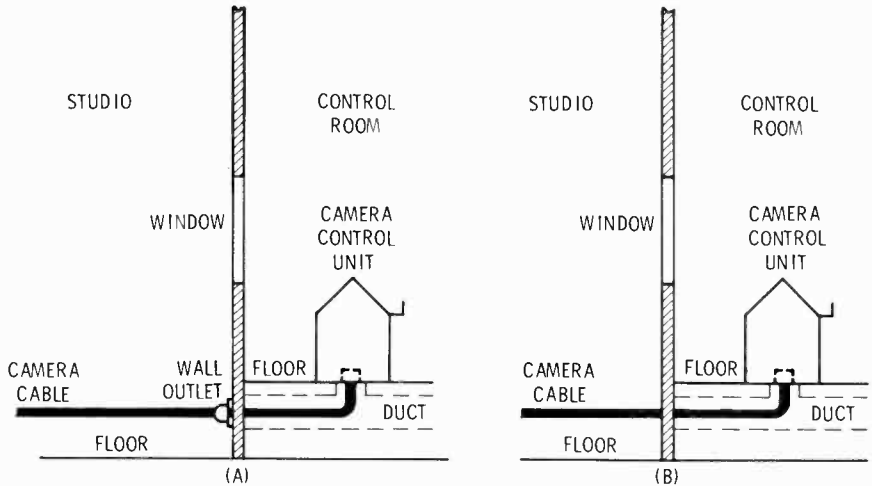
Camera cable connections: (A) Connected to wall outlet; (B) Run through the wall directly to the control unit.
